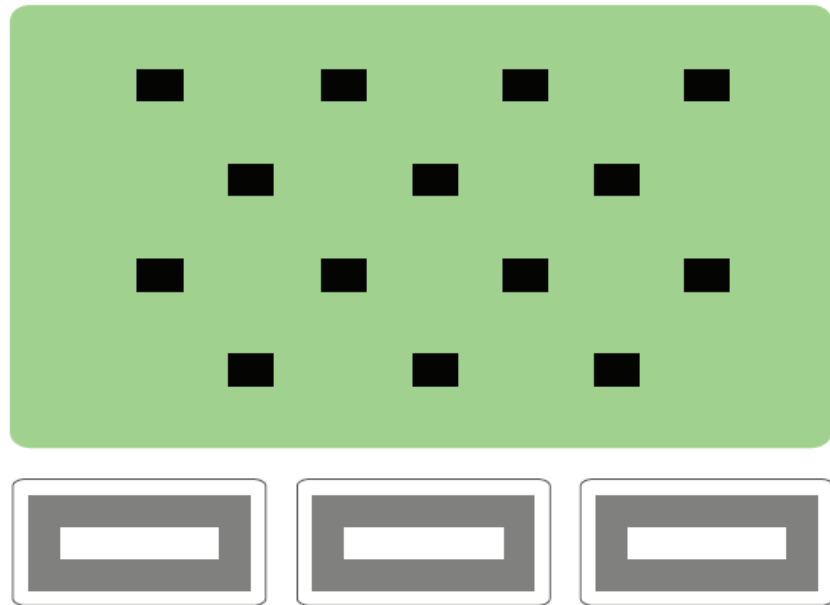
Tower type building scheme compared to other typical building. (Source: [13-10])
